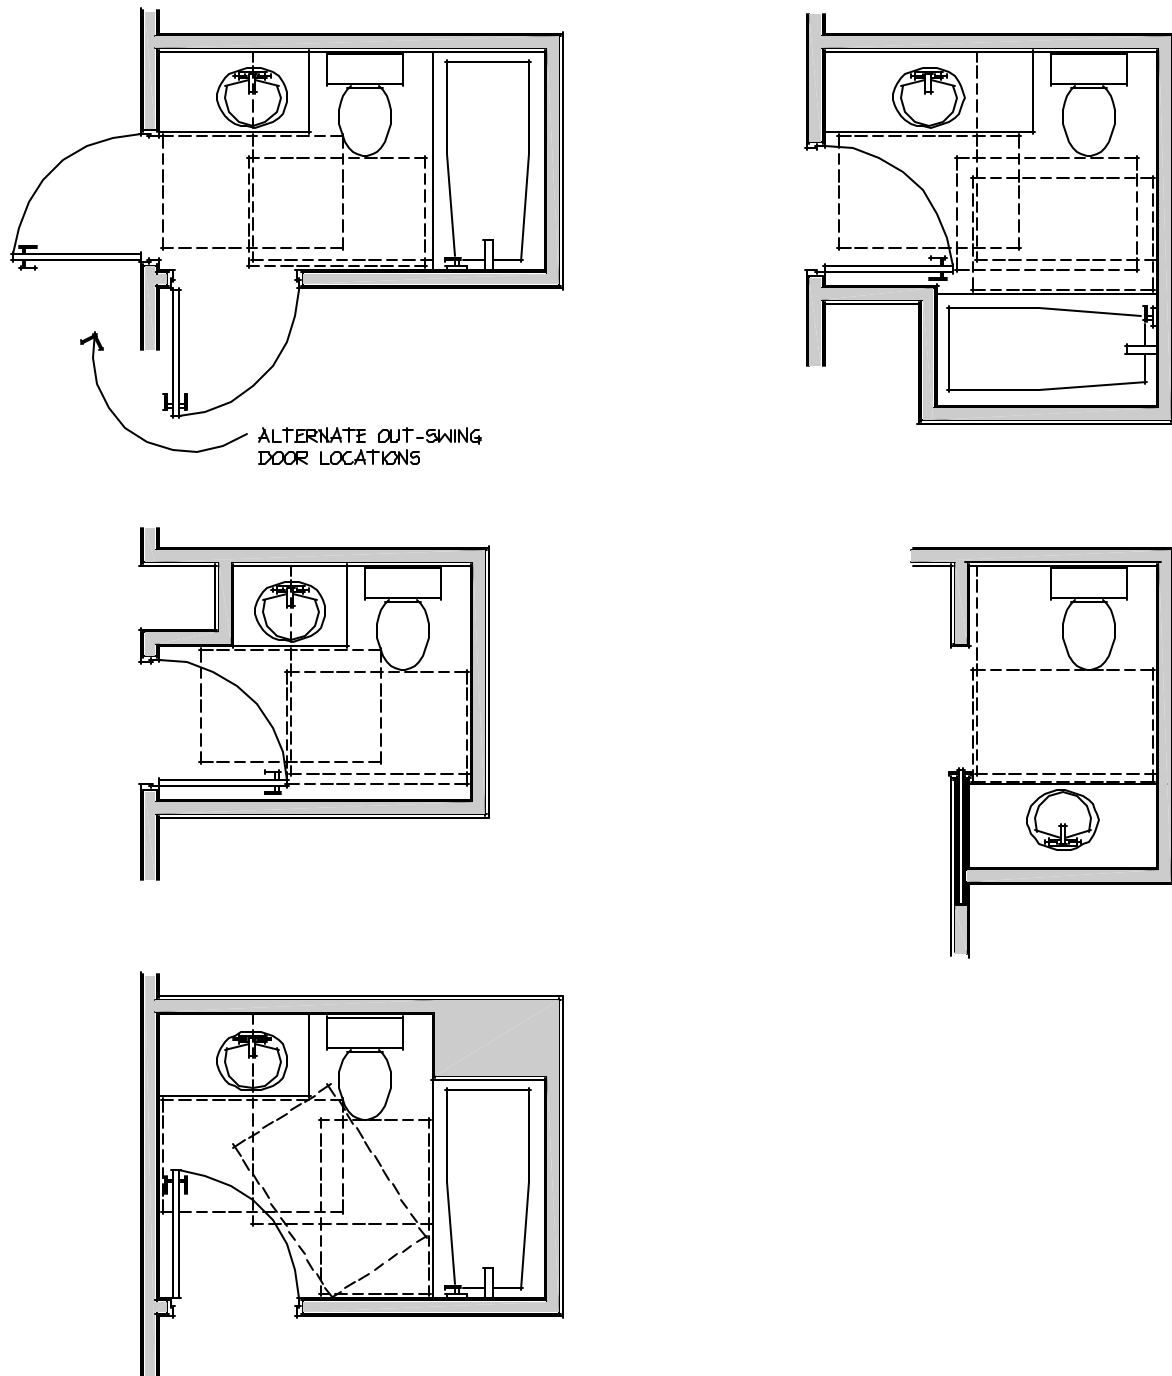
EXAMPLES OF BATHROOMS WITH FLOOR AREA TO SUIT 'MINIMALLY ACCESSIBLE' REQUIREMENTS
